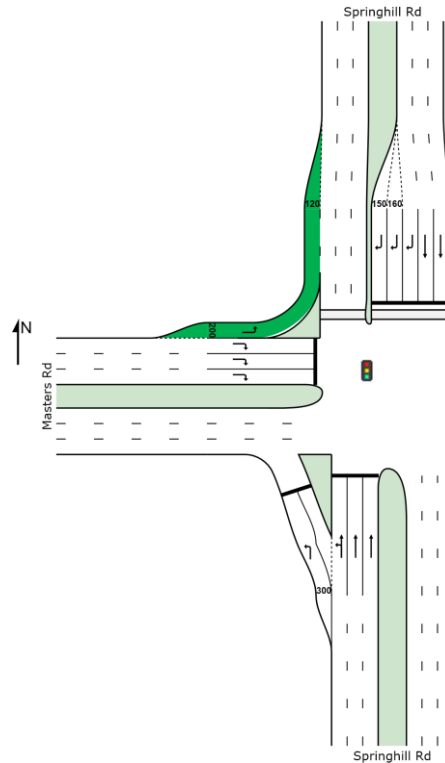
Layout of Masters Road / Springhill Road with proposed mitigation
